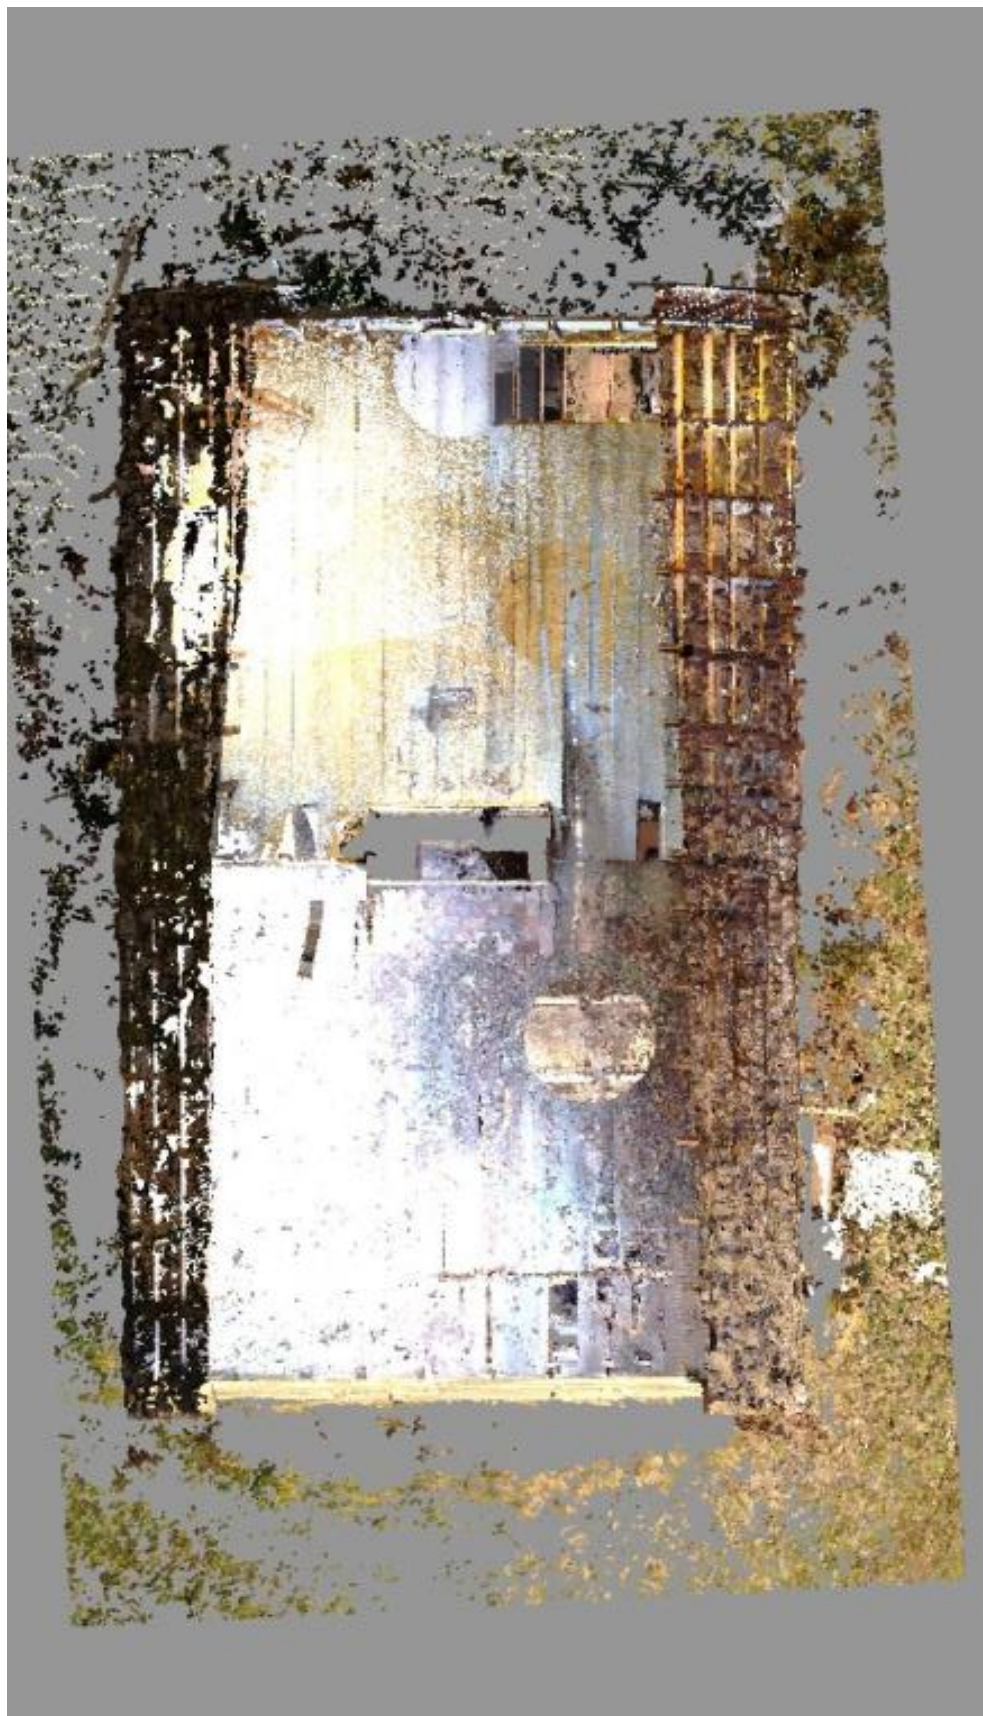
A perspective view of the plan of the second floor of the outbuilding.
